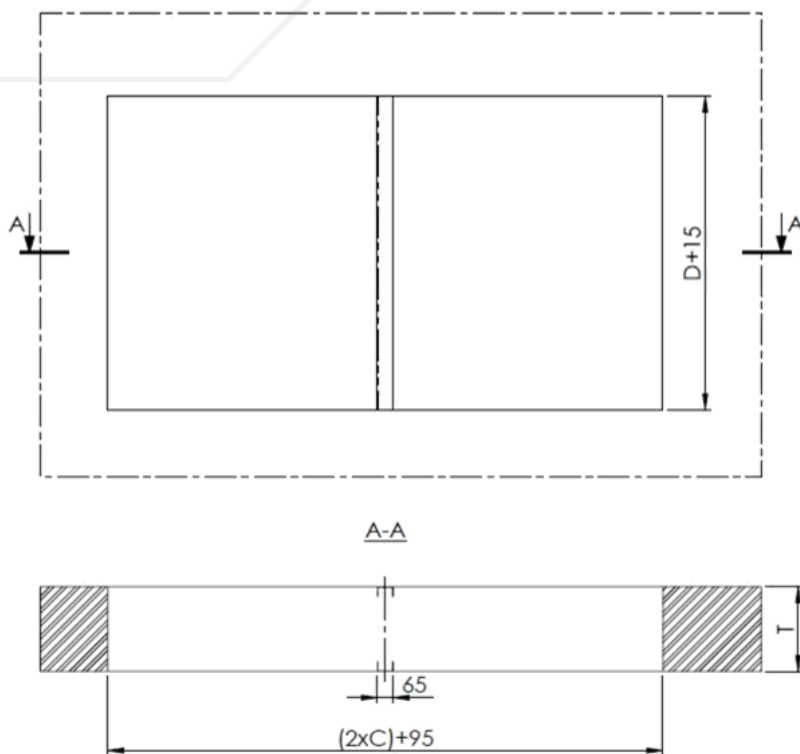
Mounting opening for CDH-F-L horizontal battery.
